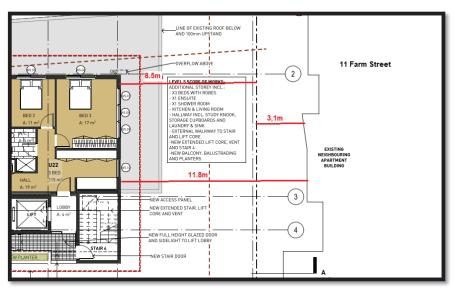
Floor plan illustrating the separation between the new addition and existing adjoining property along the eastern elevation.
